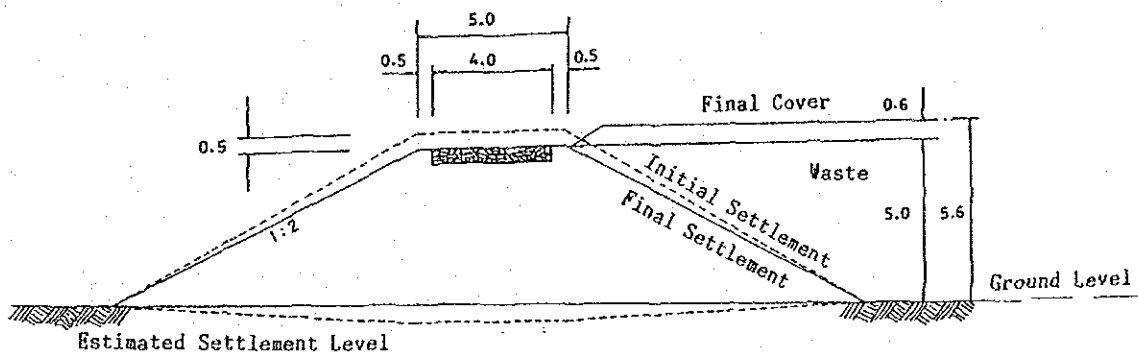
Typical Cross Section of Enclosing Bund
